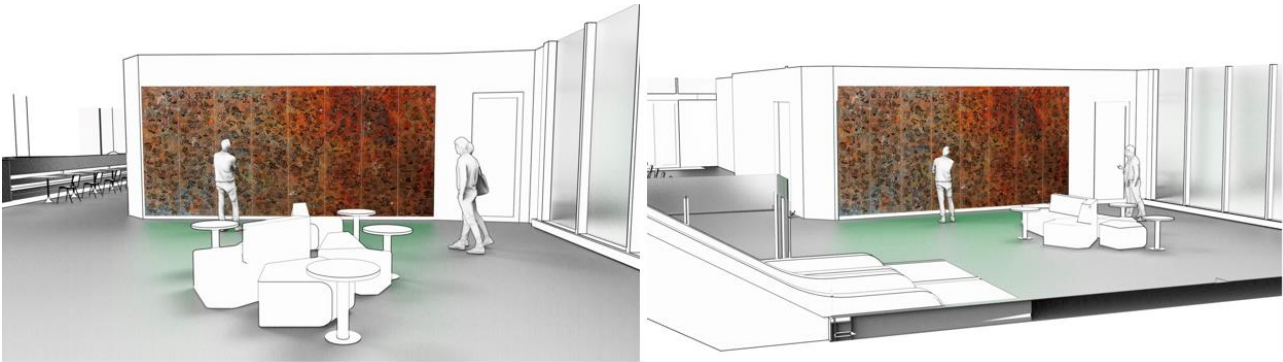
Elevation of the Wall of Hands within the Badanami Centre
